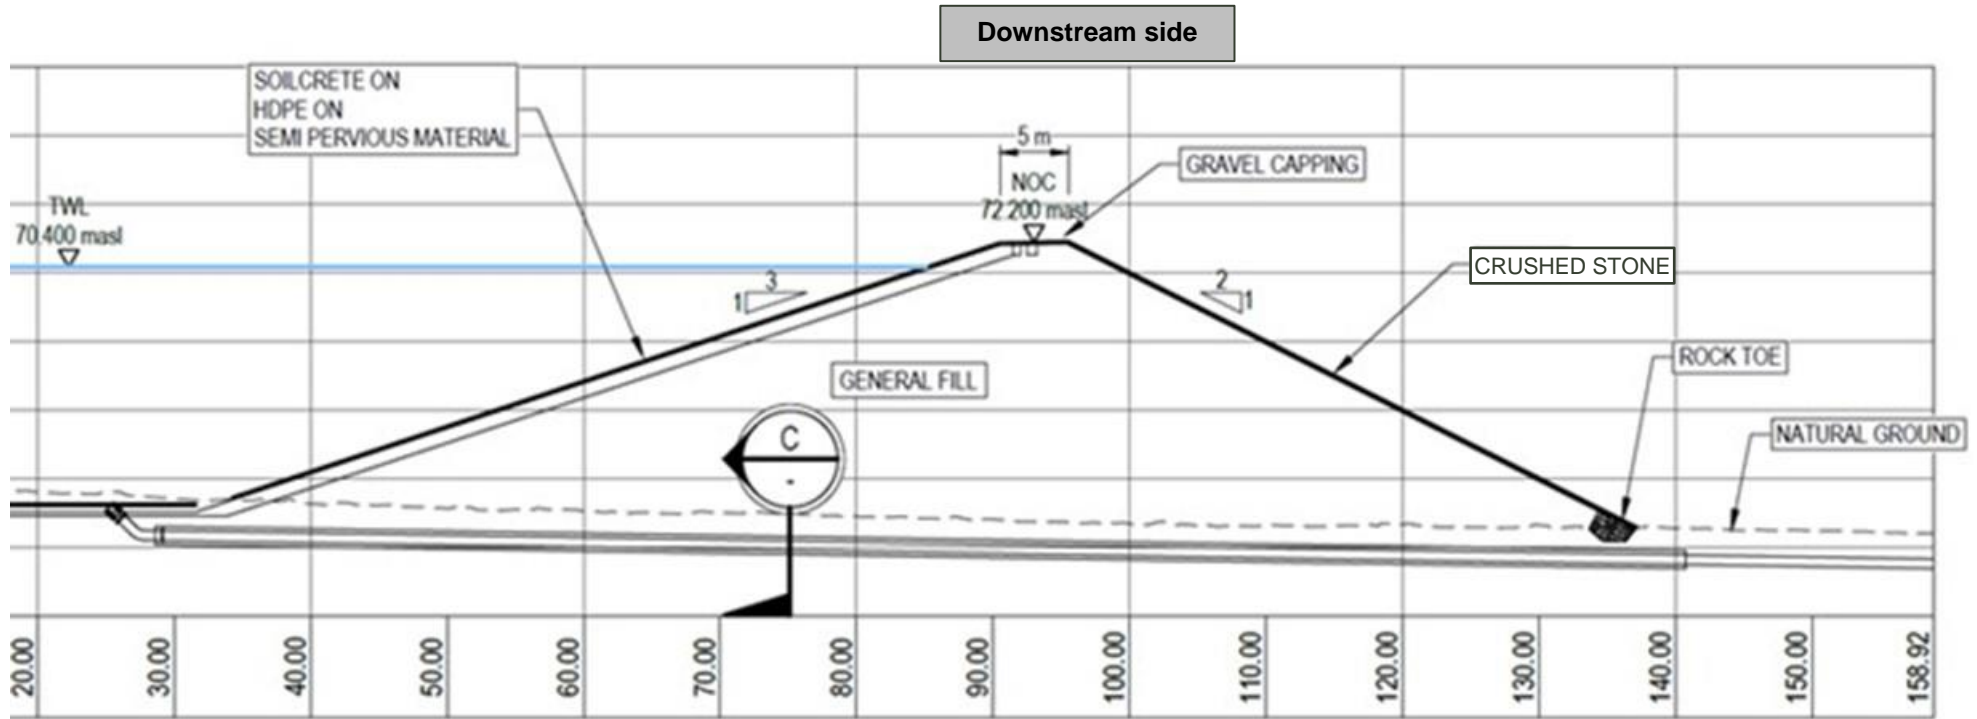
Illustrative cross-section through the proposed balancing dam embankment
